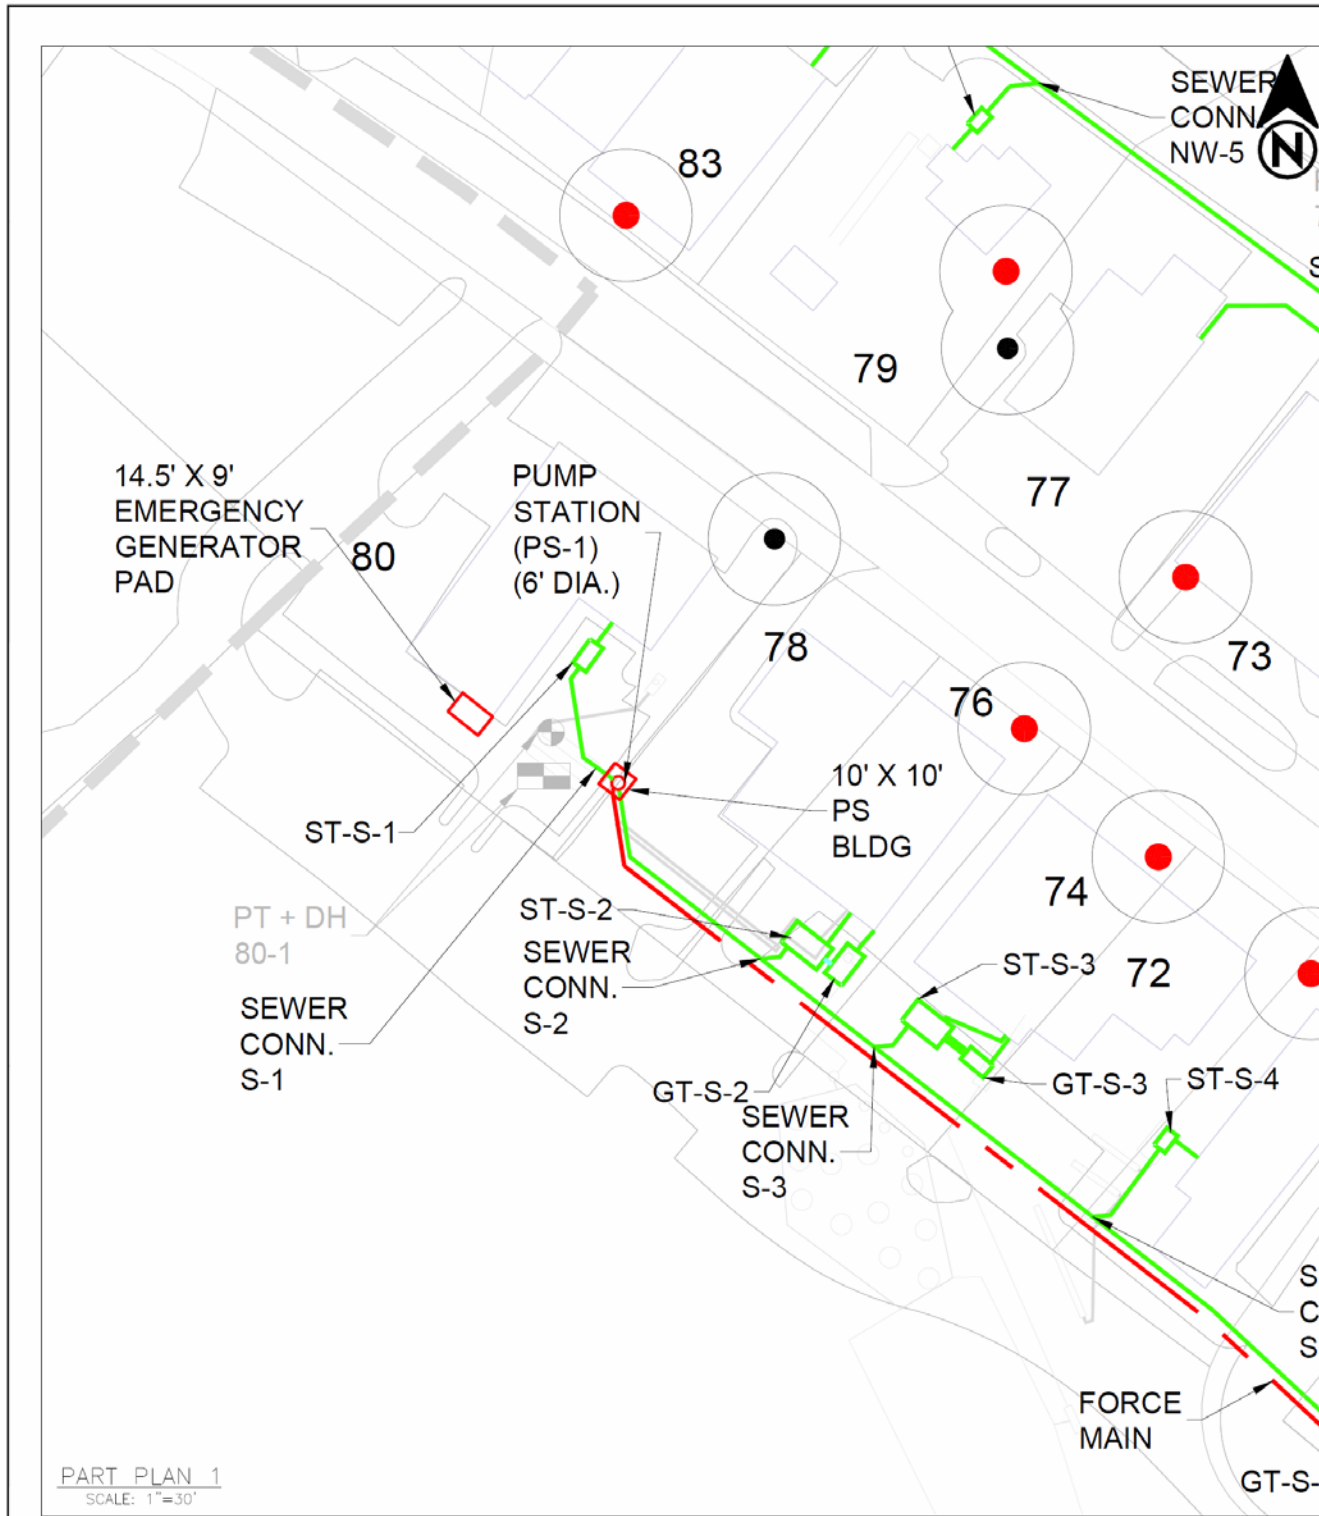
Scotts Corner Preliminary Sewer Layout Plan
